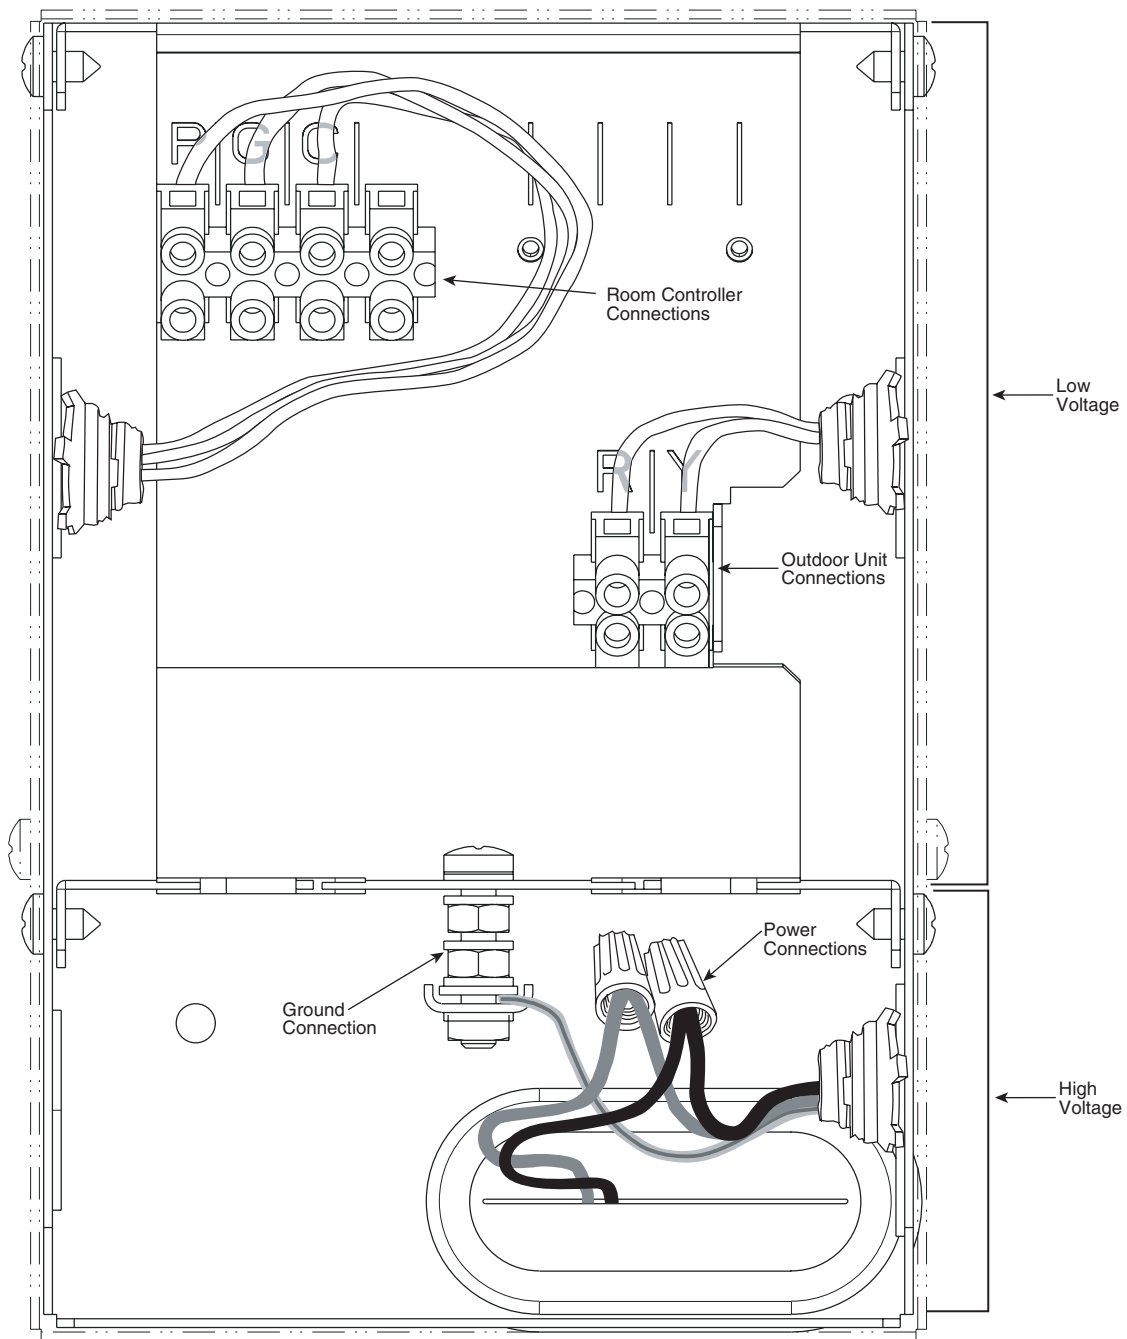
619FNF Unit Matched to 538ENF Outdoor Unit — Wiring Connection (Cooling Only System)
